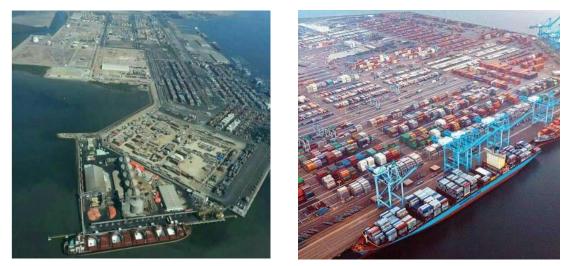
Waterfront Structures (Wharves, Seawalls and Piers)
